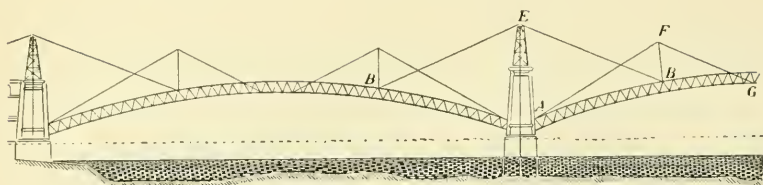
ERECTION OF EAD'S BRIDGE.
